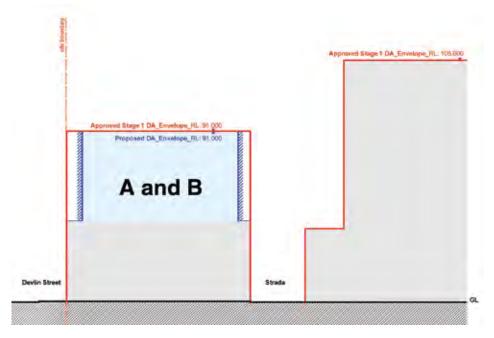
Comparison between Stage 1 approved building envelope and Stage 2 detailed design envelope. West Elevation, Devlin Street
